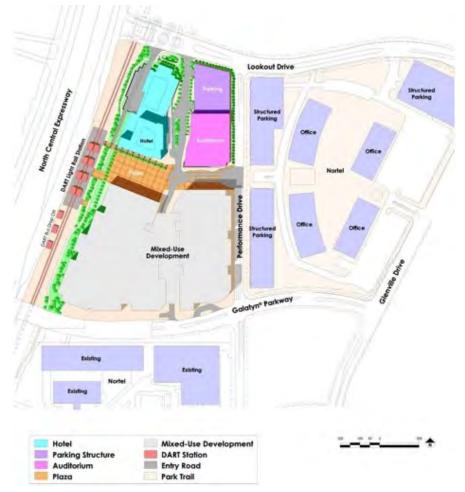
Site plan of the Galatyn Park Urban Center (Source: City of Richardson, 2009)
